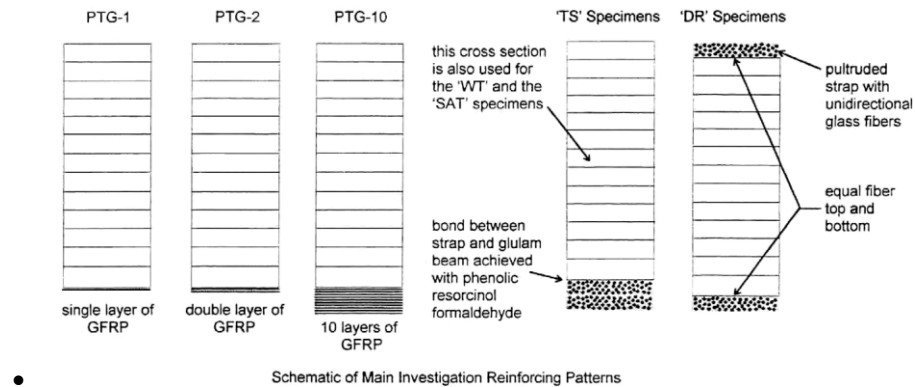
Cross sections of tested beams (Jordan 1998).
